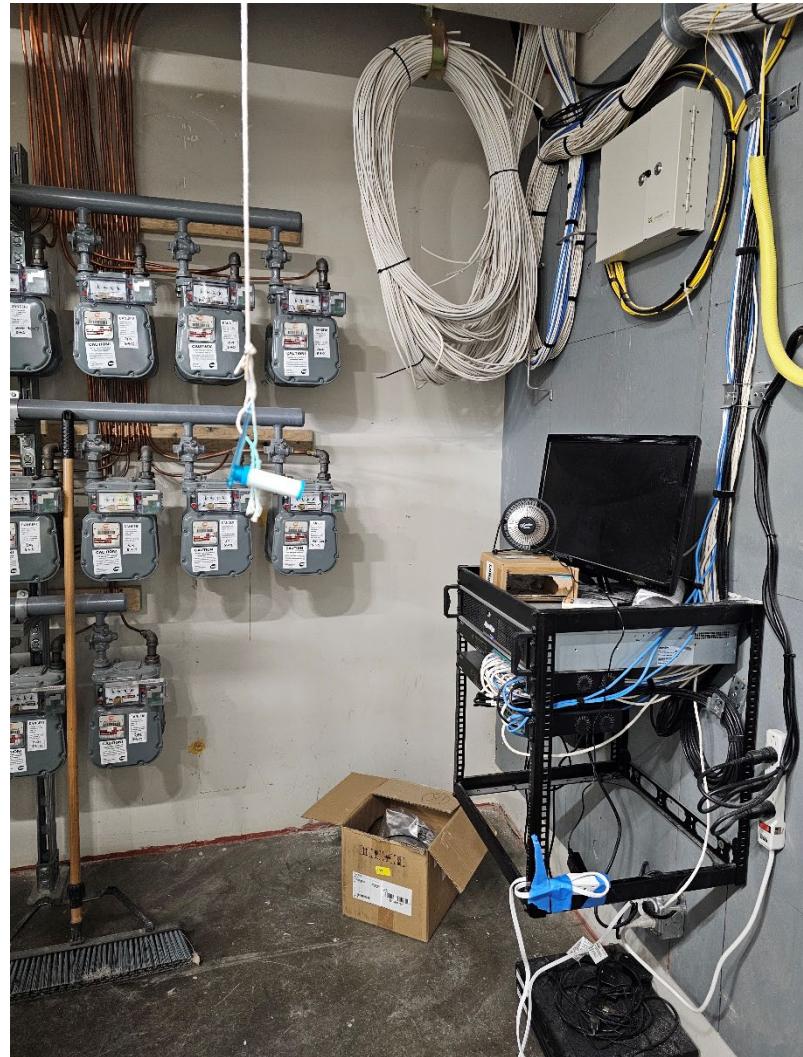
Room 1049 Storage West Passive Sampler, EB-01-AJ2
